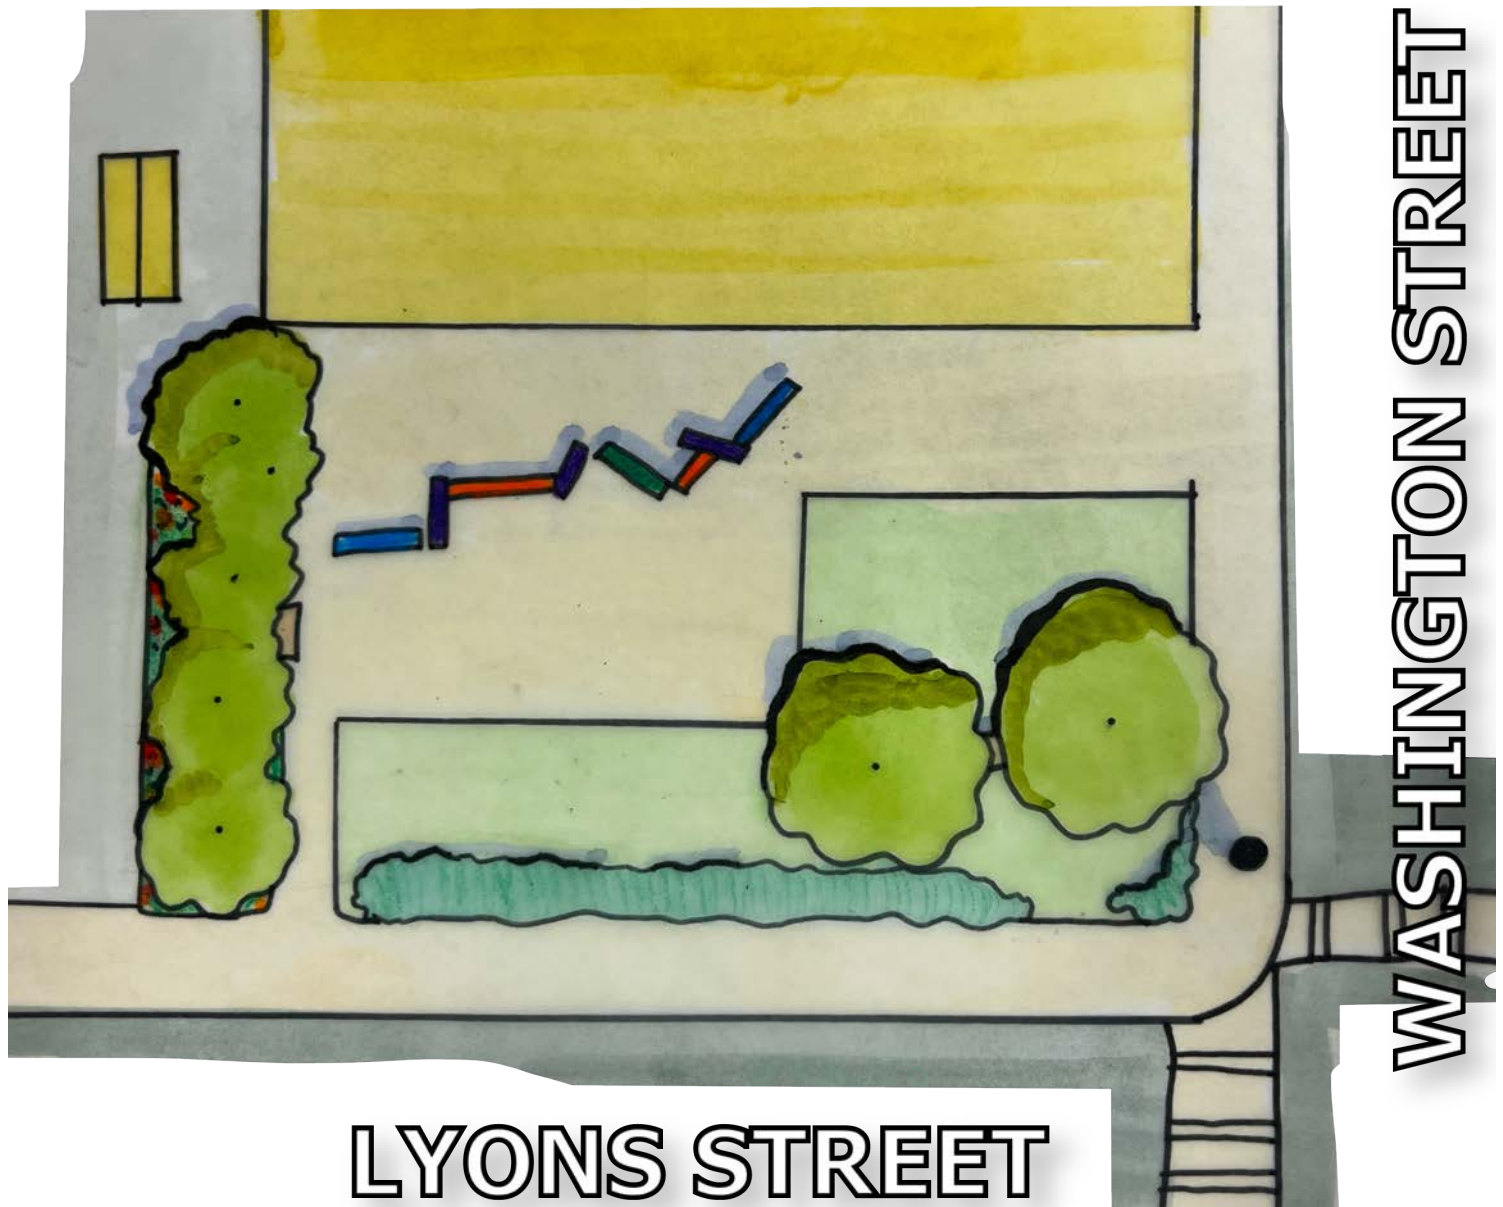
Plan view of the northwest corner of the intersection of Washington Street and Lyons Street.
